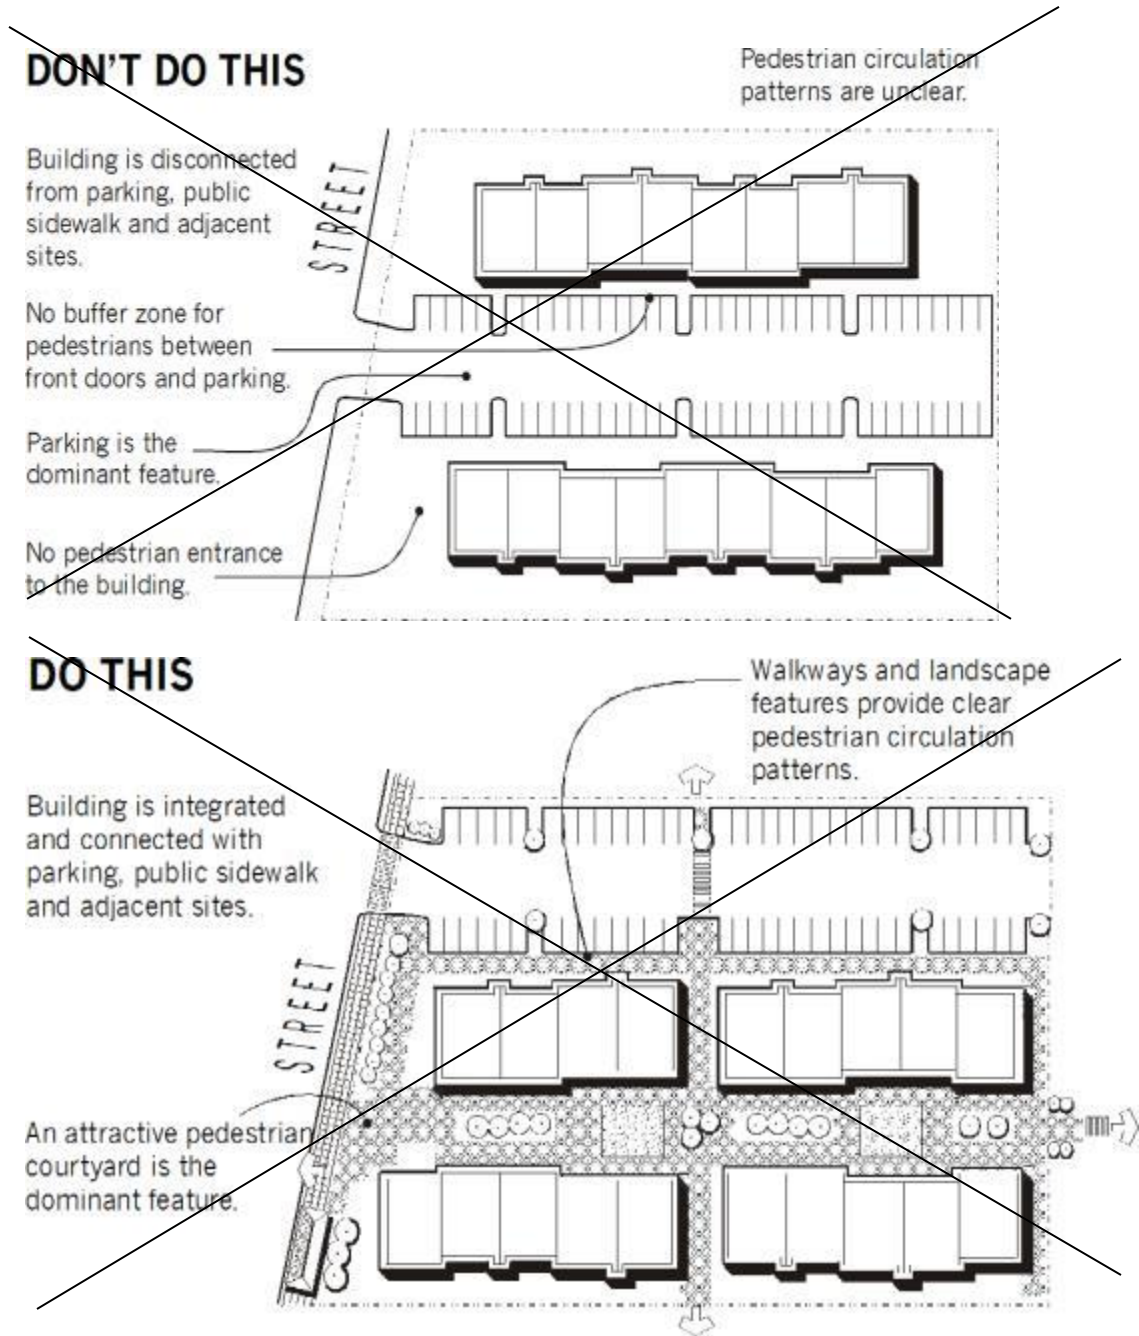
(D): Avoid parking that dominates the site. Encourage parking located behind or on the side of buildings and common open space between buildings.
